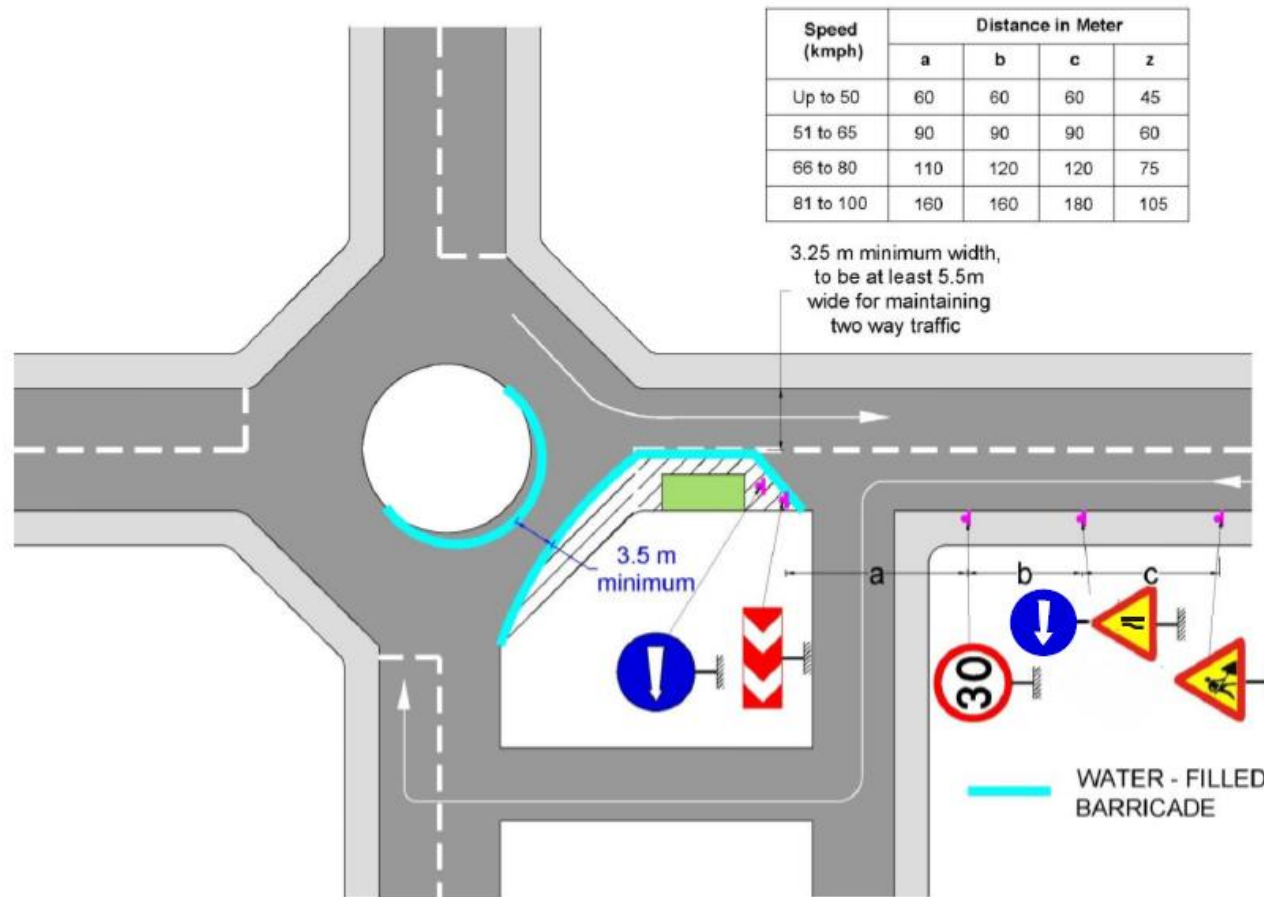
Road Work at Roundabout with Constricted Circulatory Carriageway
